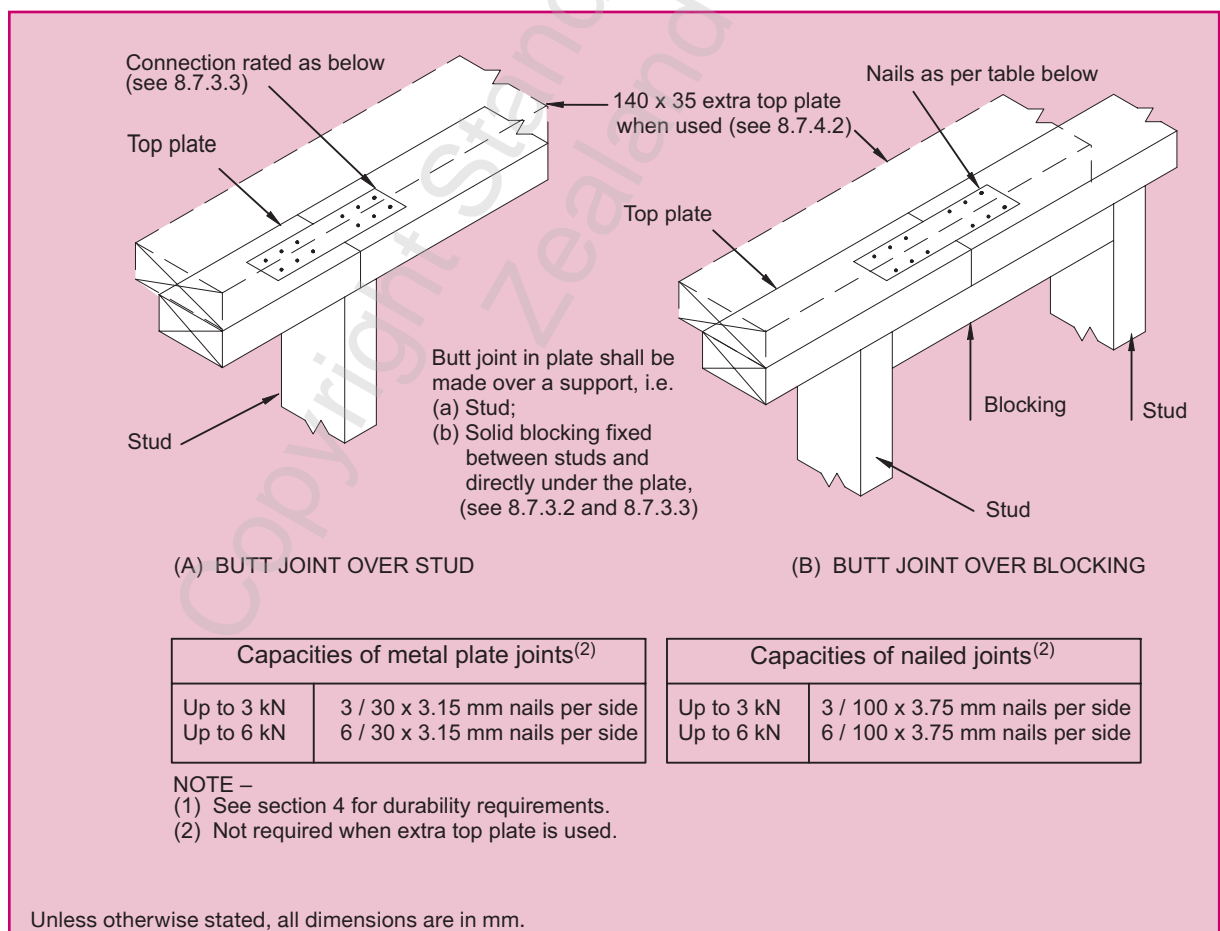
Connecting top plates in line – Walls containing bracing (see 8.7.3.3)
